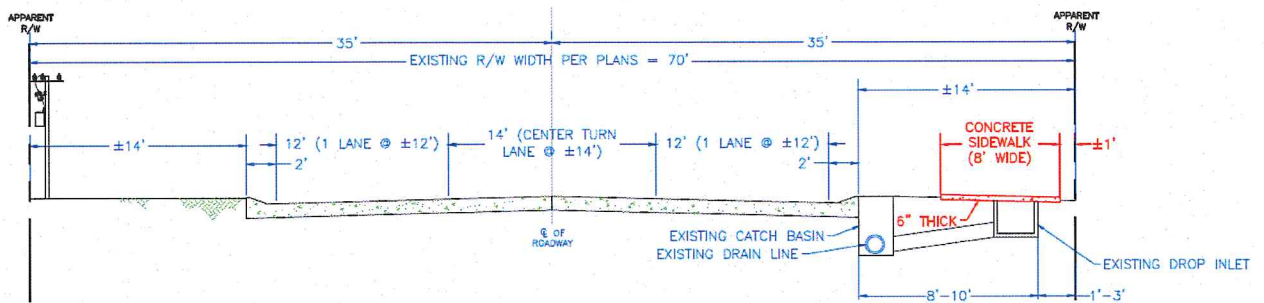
LA 1040 – Old Baton Rouge Highway to US 51 – Proposed Typical Section
